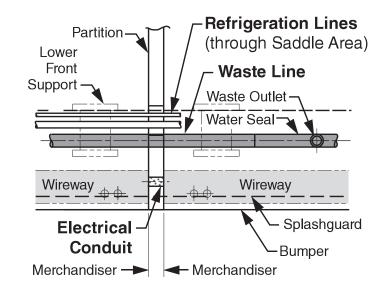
Piping, Refrigeration and Electrical Routes for LifeLine Merchandisers in STANDARD Lineup (NO DRY GOODS OR BUMP OUT)
